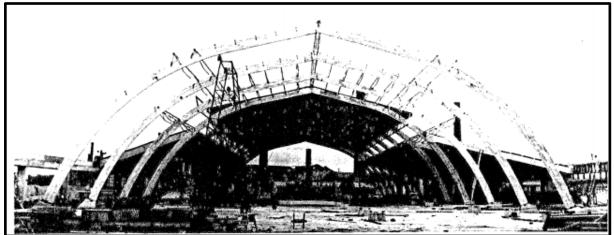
Arches under construction at Symonds St Peters Factory (Holland Street section), c1946. (Source: Nolan, 1994)
